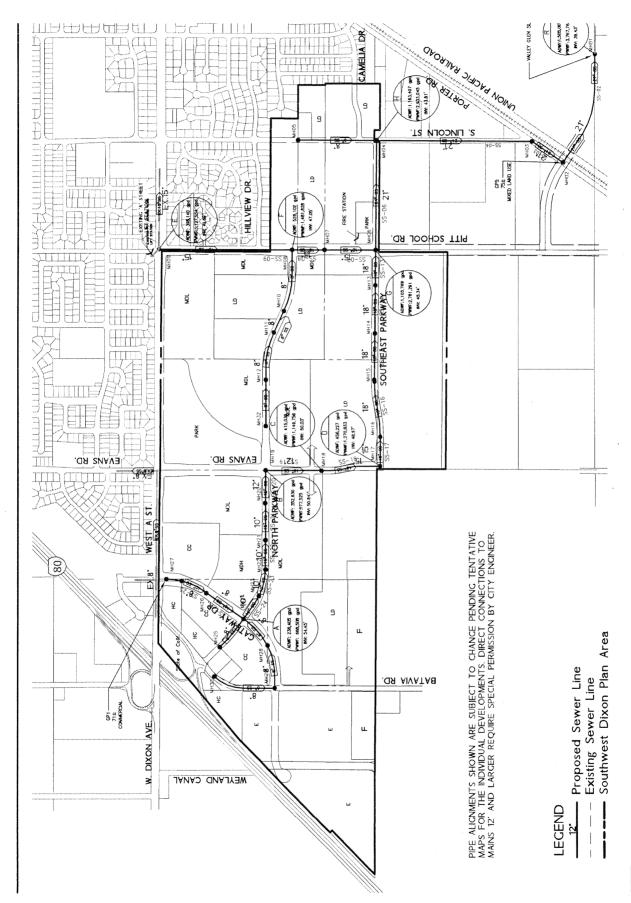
CONCEPTUAL SEWER MASTER PLAN
